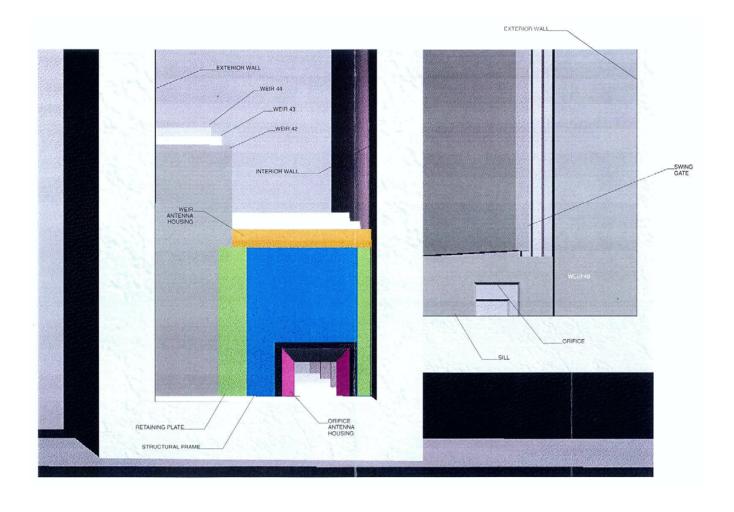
Antenna Housing Installation - Looking North from Just Downstream of Weir 42
